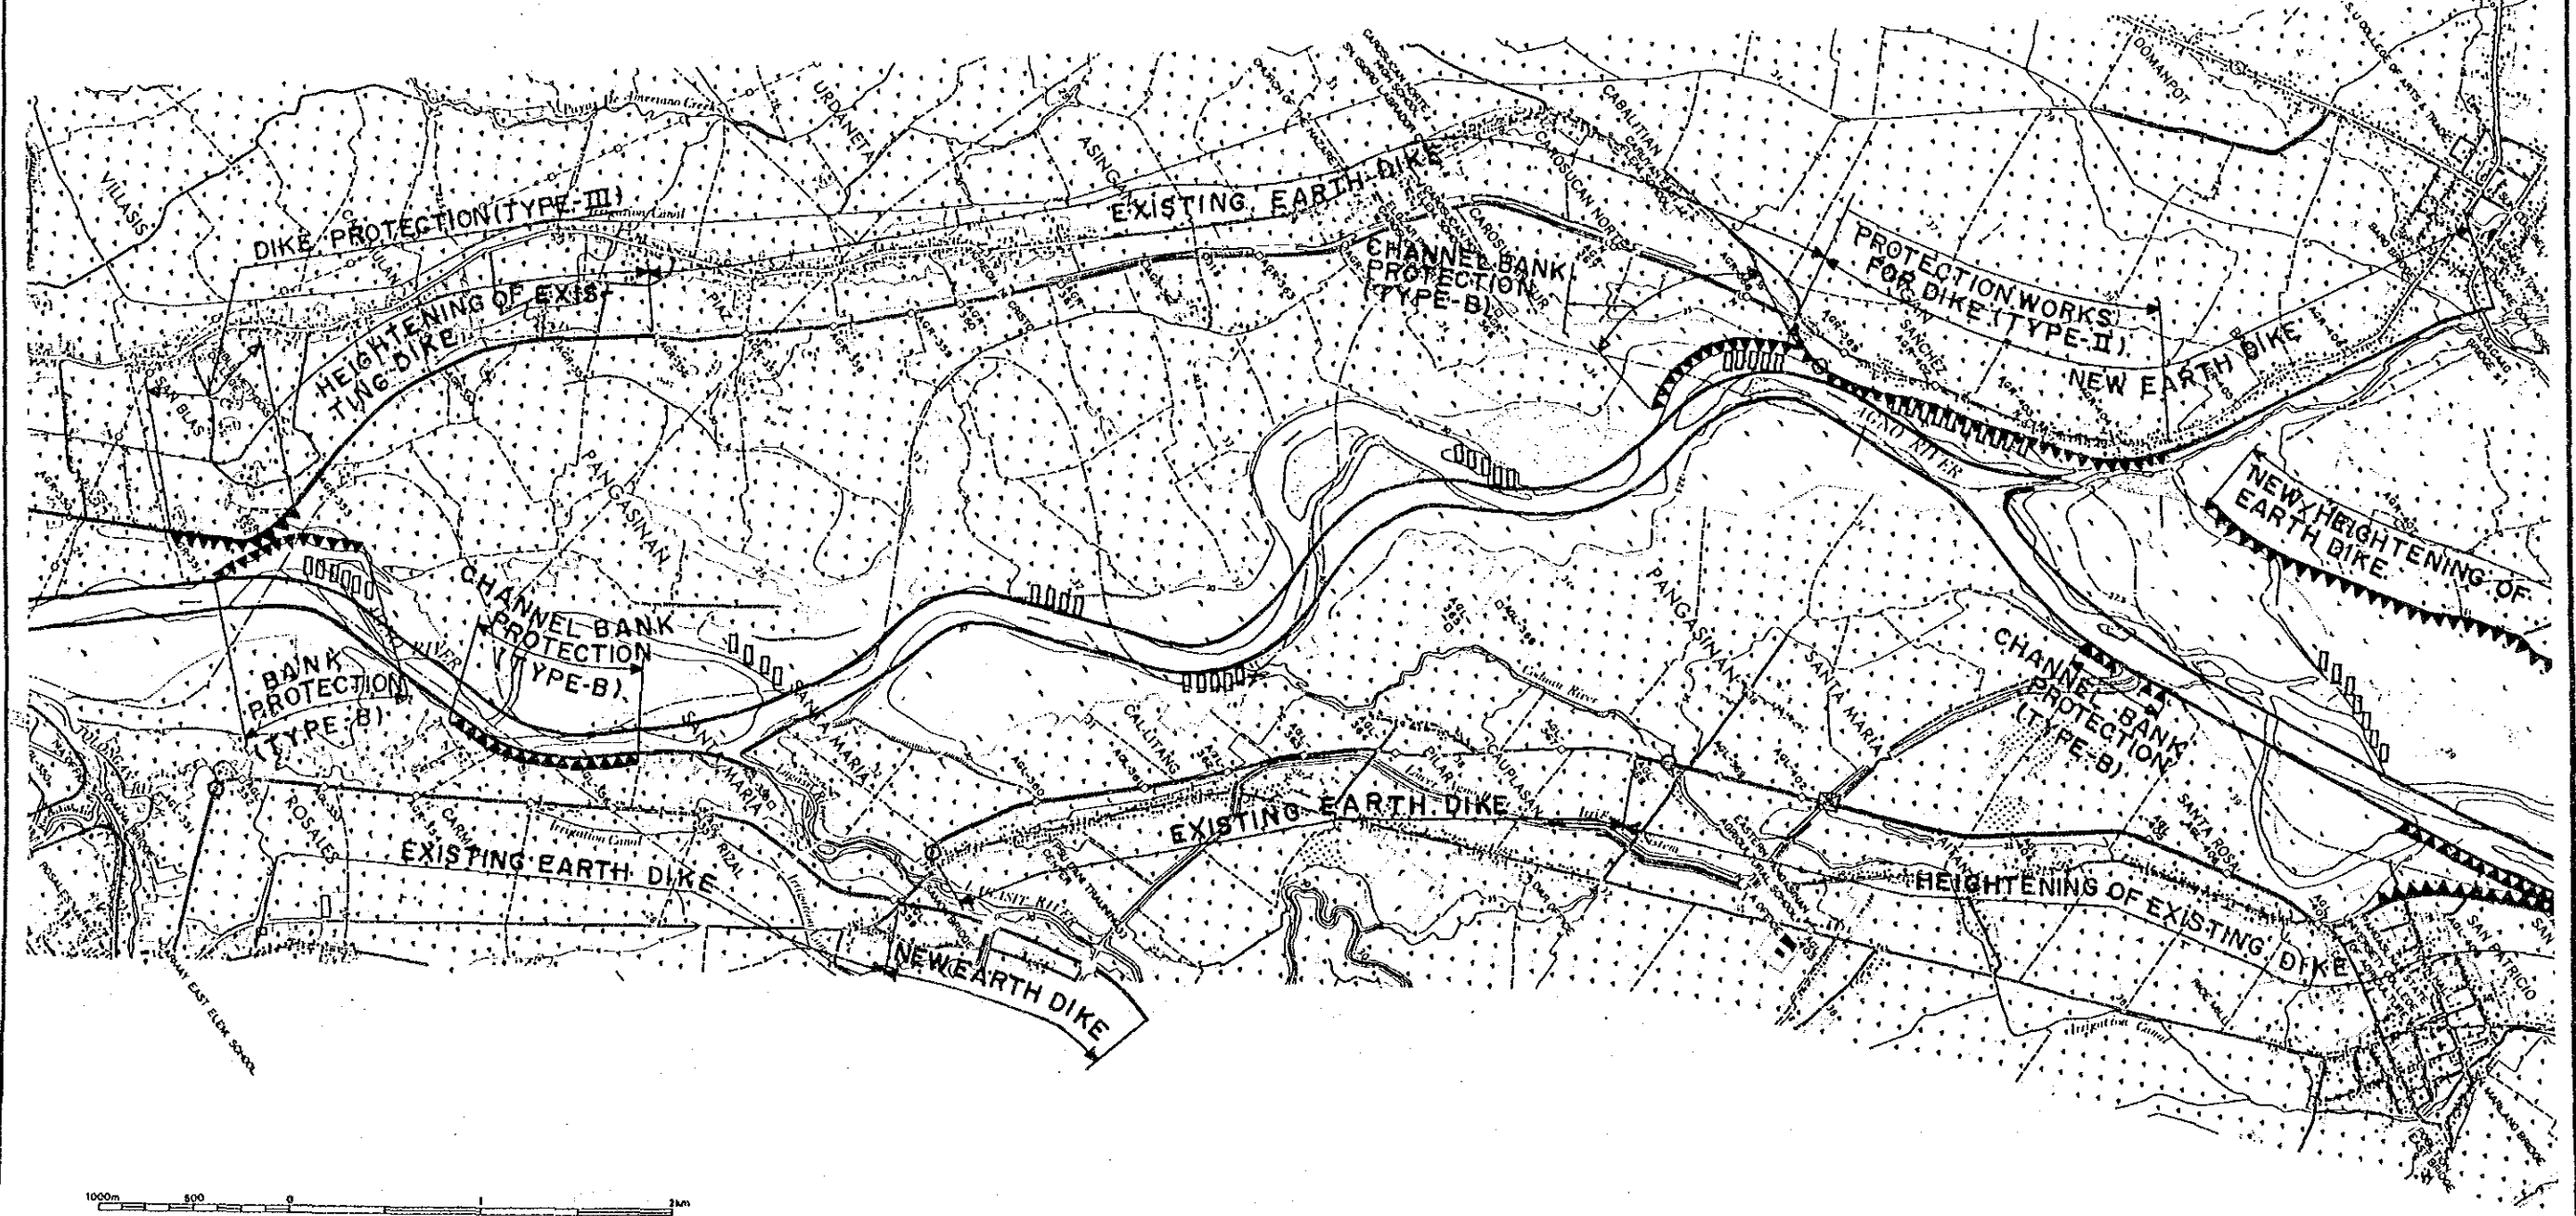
(3/5) DESIGN PLAN OF UPPER AGNO RIVER
